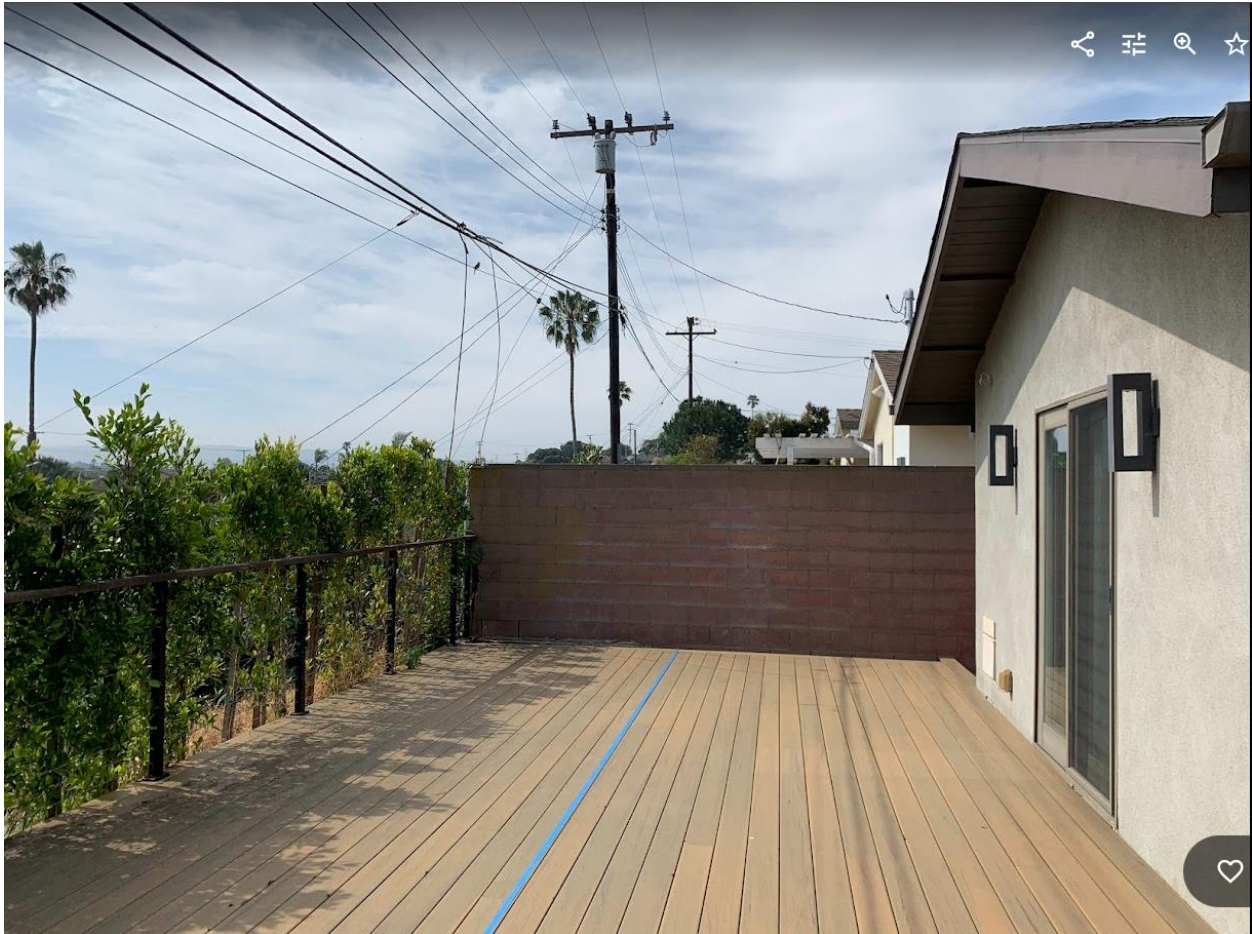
C: 5608 White Ct after deck construction. Note: appealing 10' setback from blue line toward the property line.
